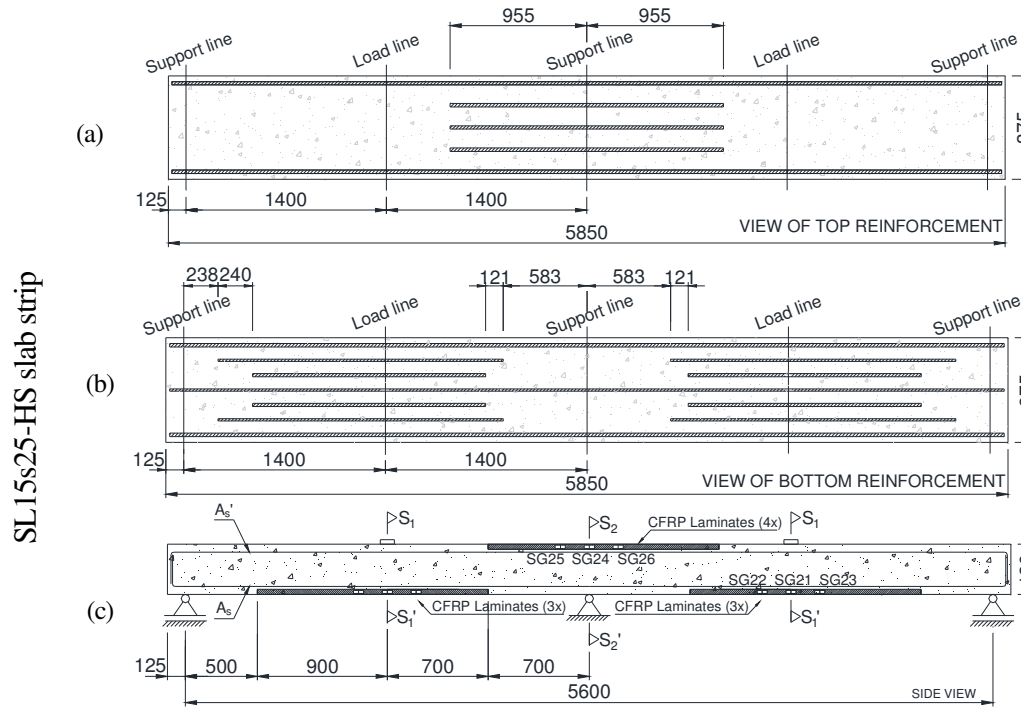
Arrangement of the (a-b) longitudinal steel reinforcement and (c) CFRP laminates of the SL15s25-H slab strip.
